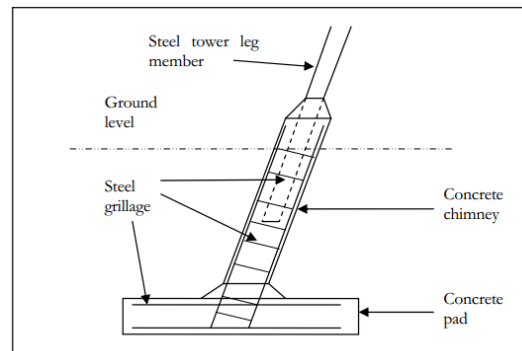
9 Typical construction of transmission tower steel grillage foundation. [13]
